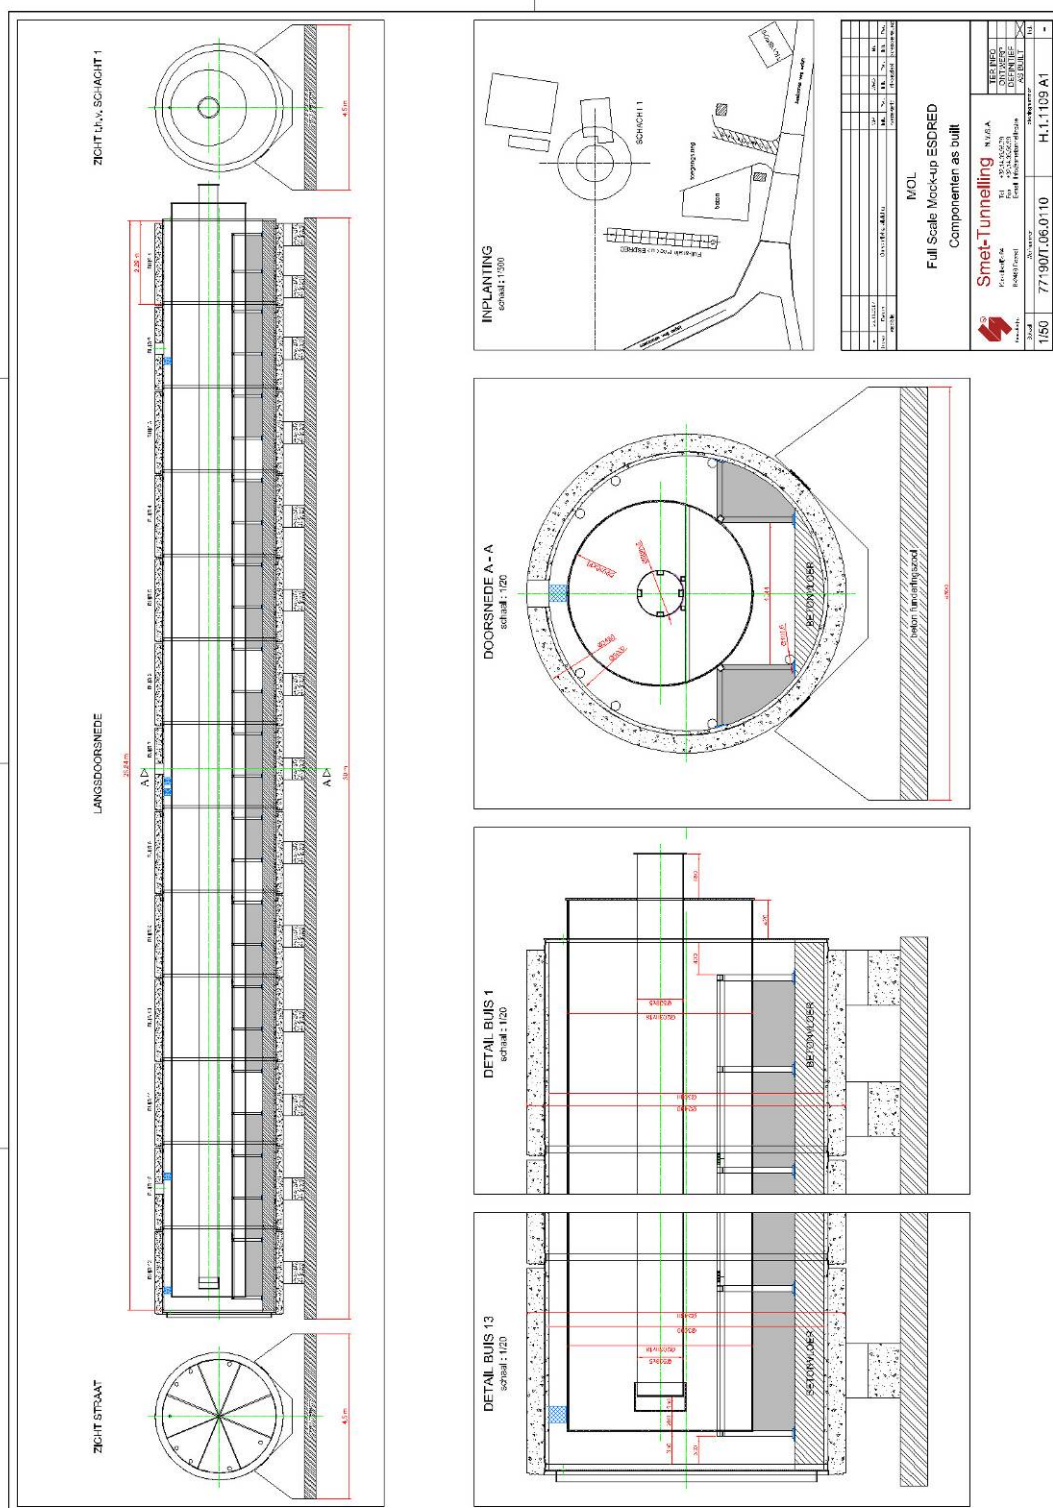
As-built overview plan of the full-scale mockup for backfill grout test
